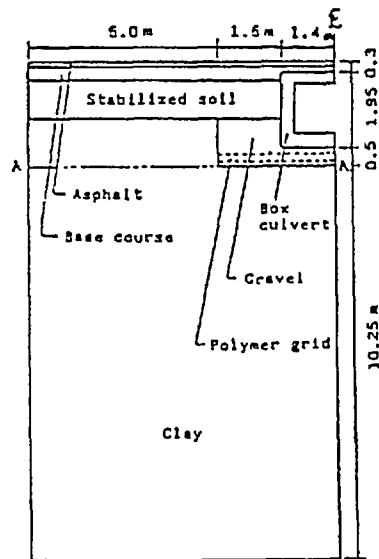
Box culvert construction with reinforced gravel foundation on soft Ariake clay.
